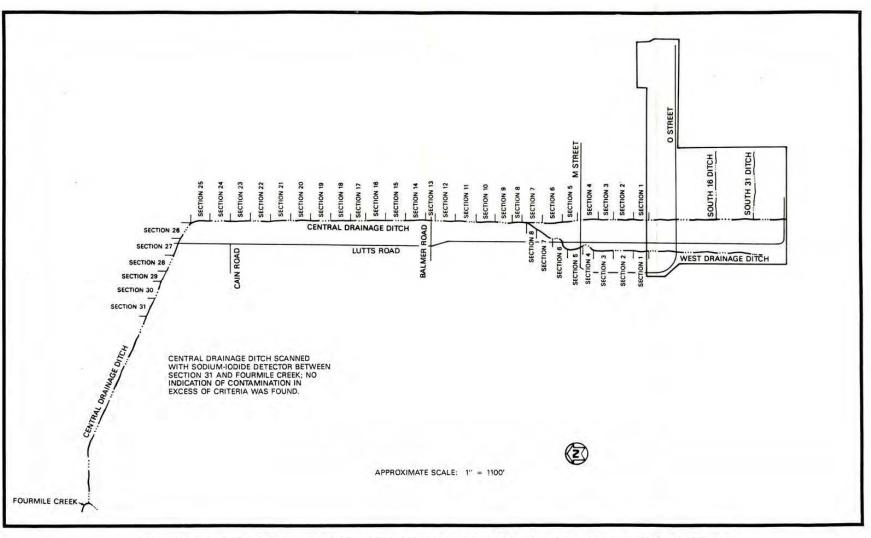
LOCATION AND REFERENCE DRAWING FOR THE WEST AND CENTRAL DRAINAGE DITCH EXCAVATIONS
